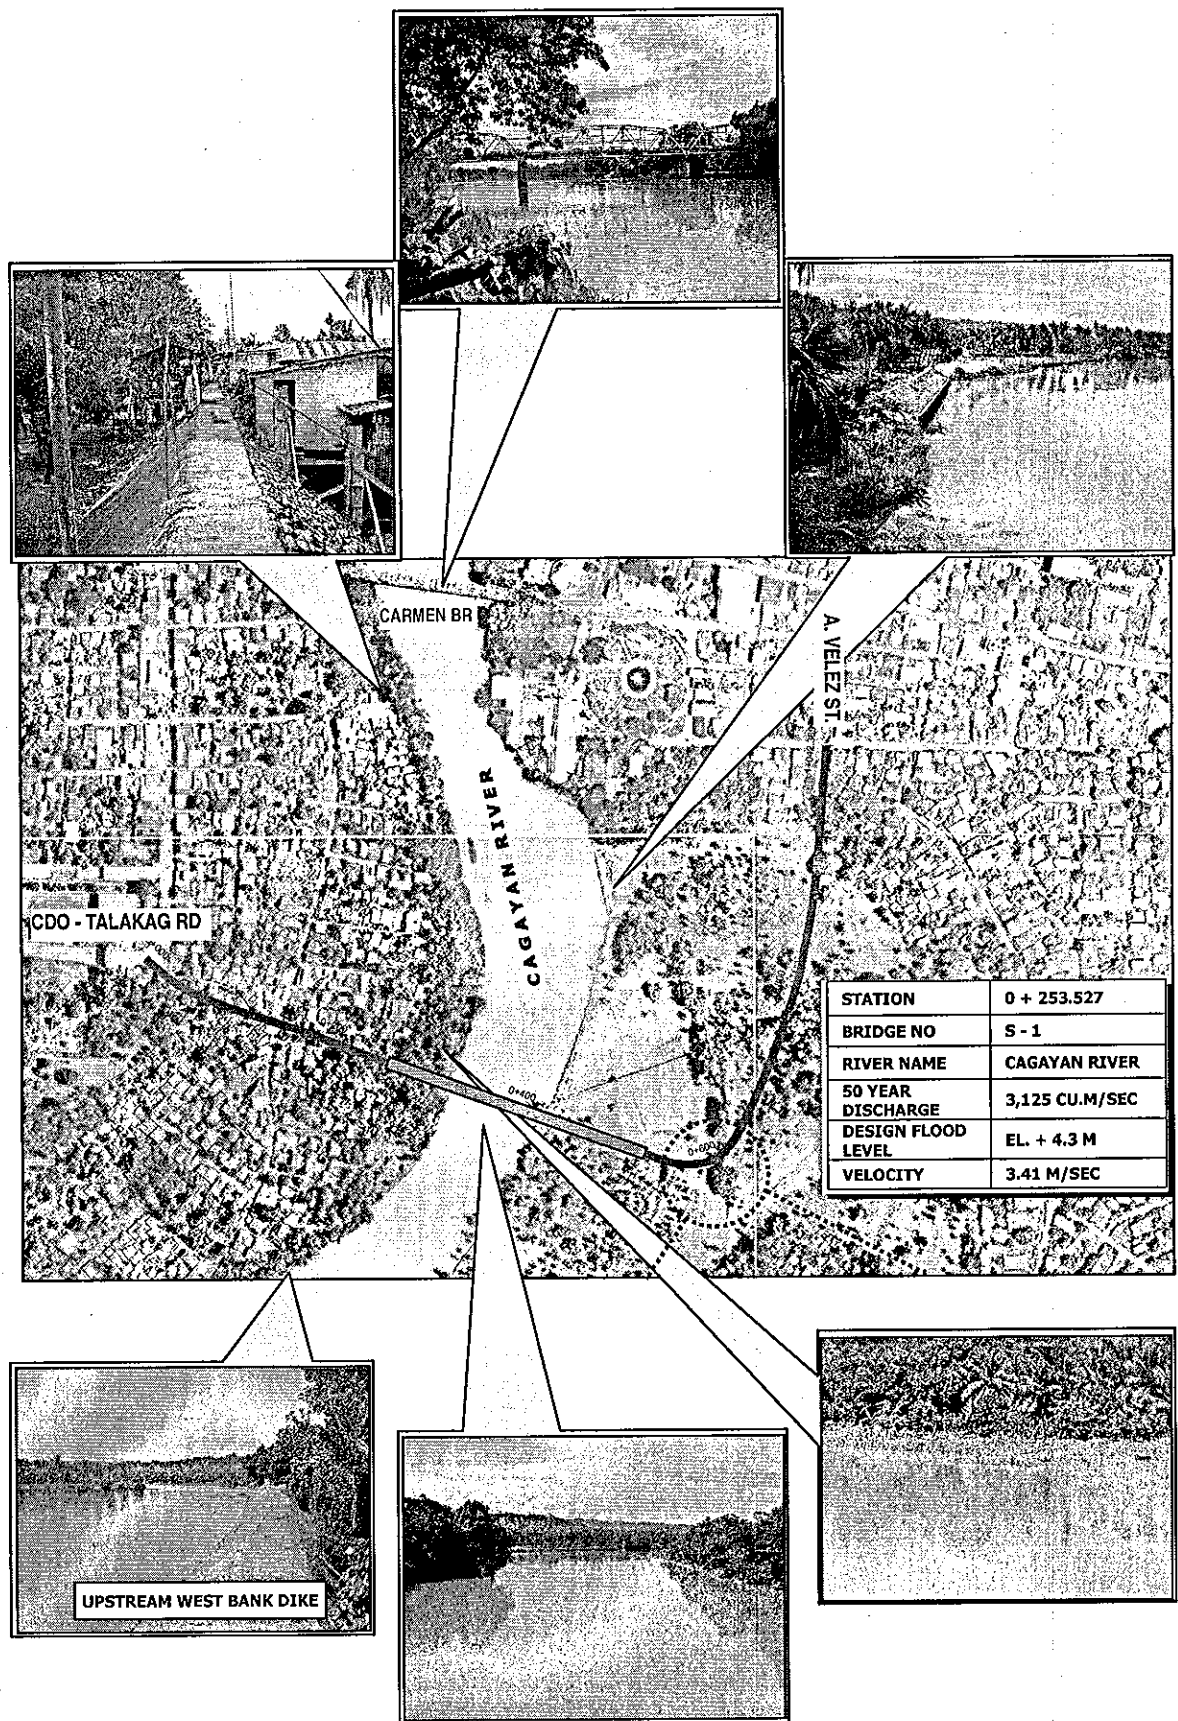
RIVER CONDITION AT PROPOSED BRIDGE SITE
